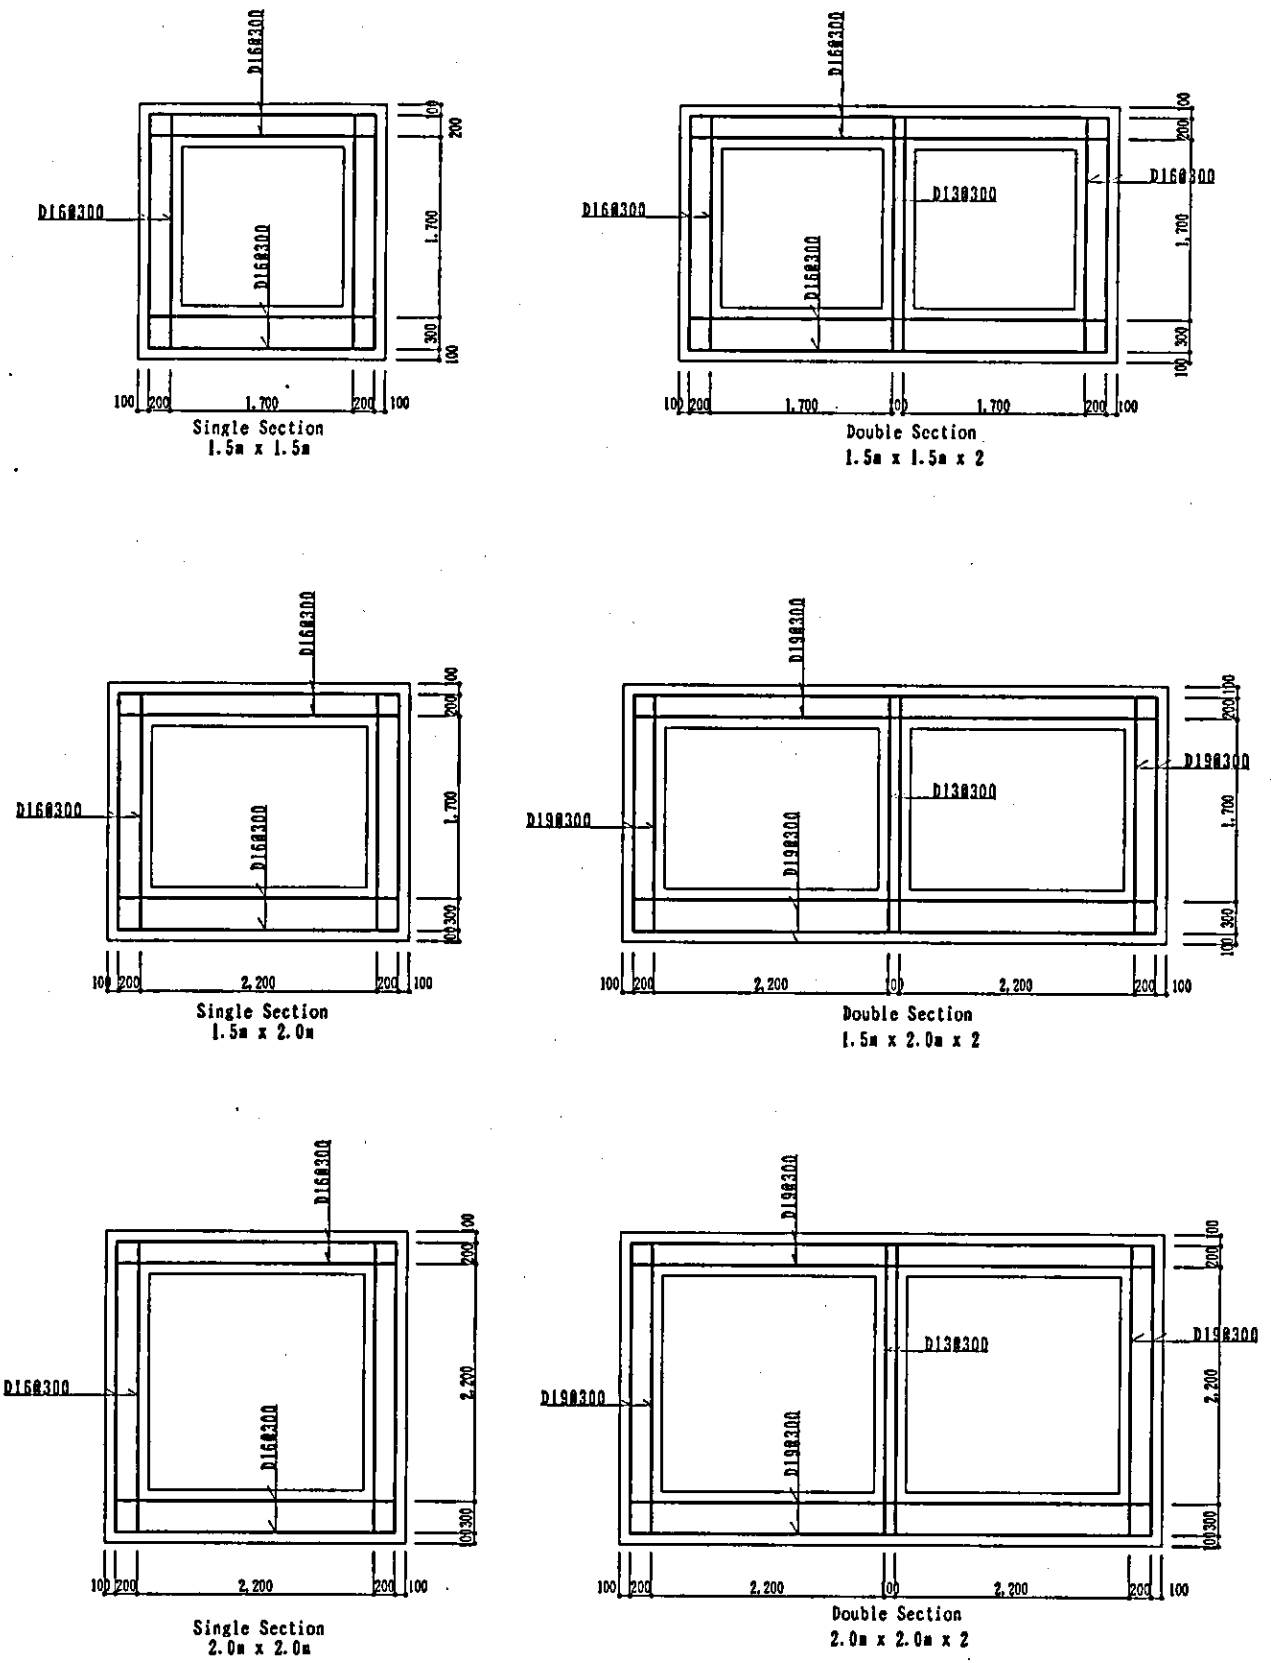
Reinforcement Arrangement for Box Culvert
